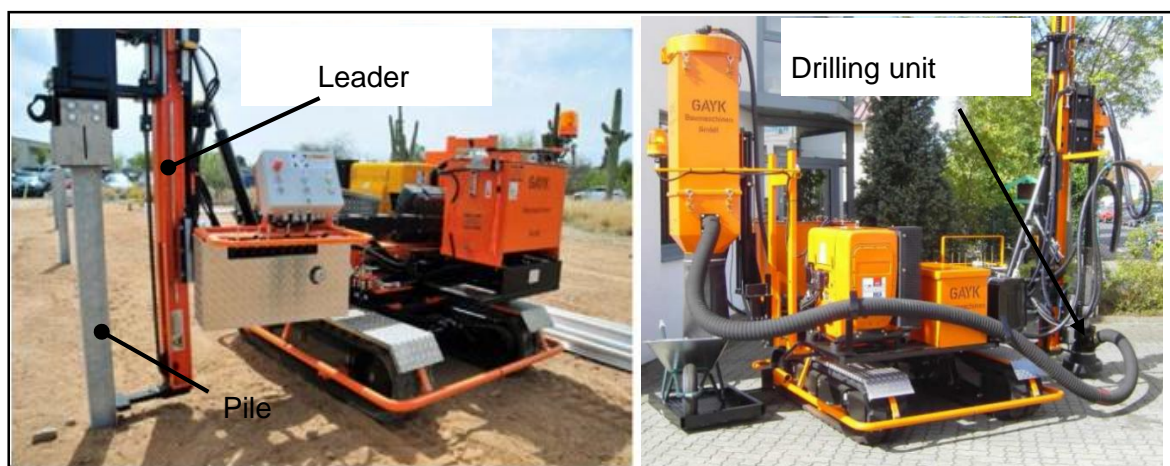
GAYK™ Hydraulic ram used in solar panel post installation (Schletter 2010)
